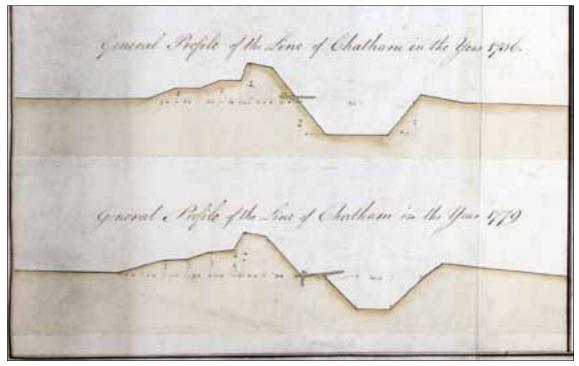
Detail from the above plan showing profiles of the ramparts in 1756 and as planned in 1779 (TNA UK MPH1/358).
